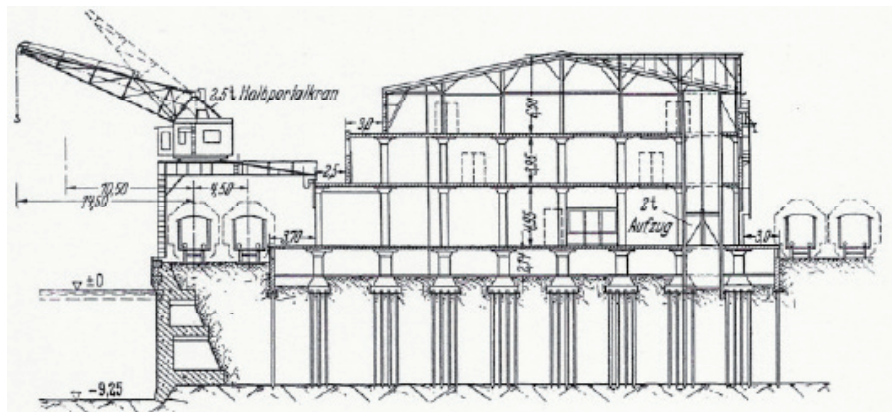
Terminal layout in Malmo around 1900 including shed and railway connection [Bolle 1941]
